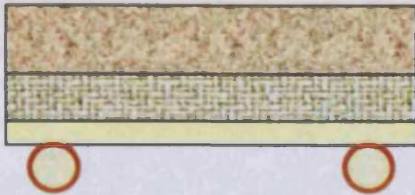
The wood trunk carries the roof layer as it constructed in the case studies.
